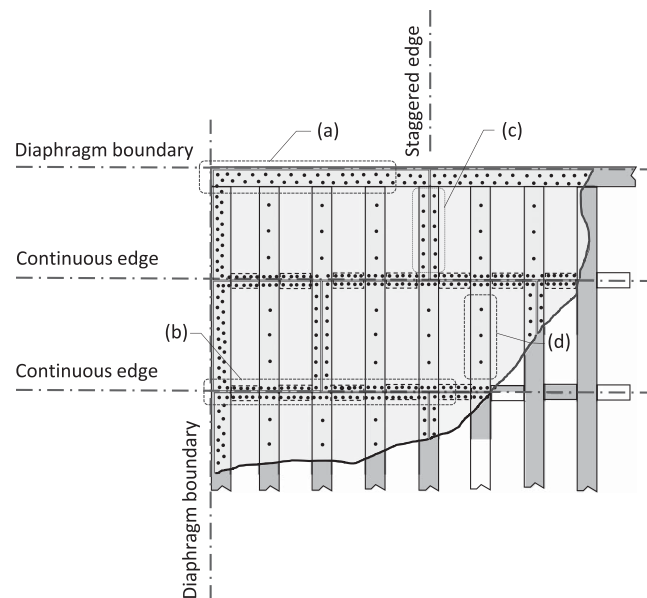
Partial plan view of a blocked diaphragm nailing pattern with different spacings at (a) boundaries; (b) continuous panel edges; (c) staggered edges; and (d) interior field of panels.
